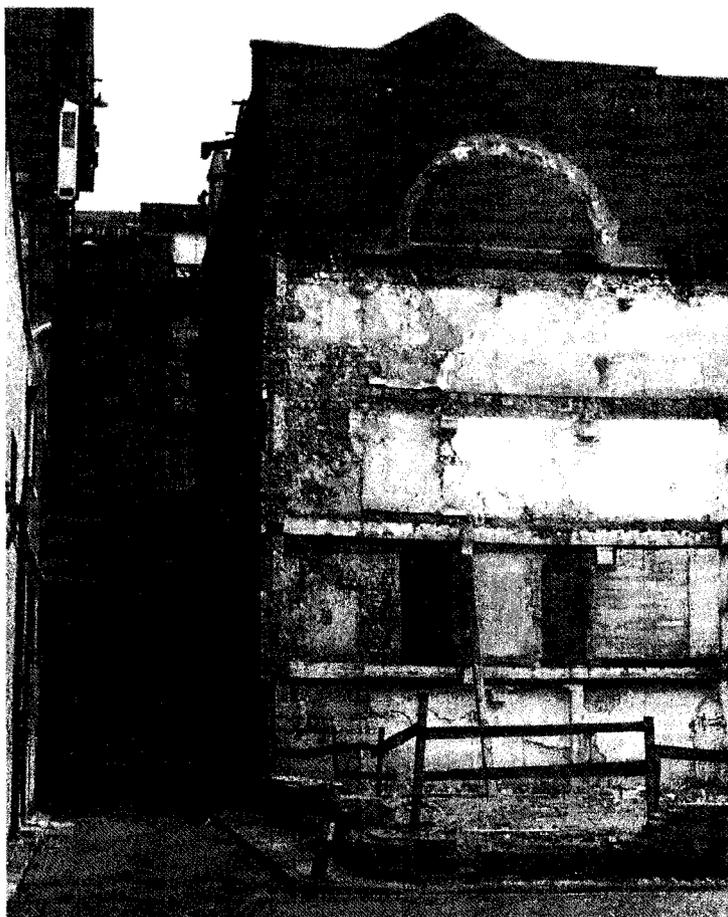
Winchester Palace wall fragment revealed during rebuilding of a warehouse, 1960-63.
